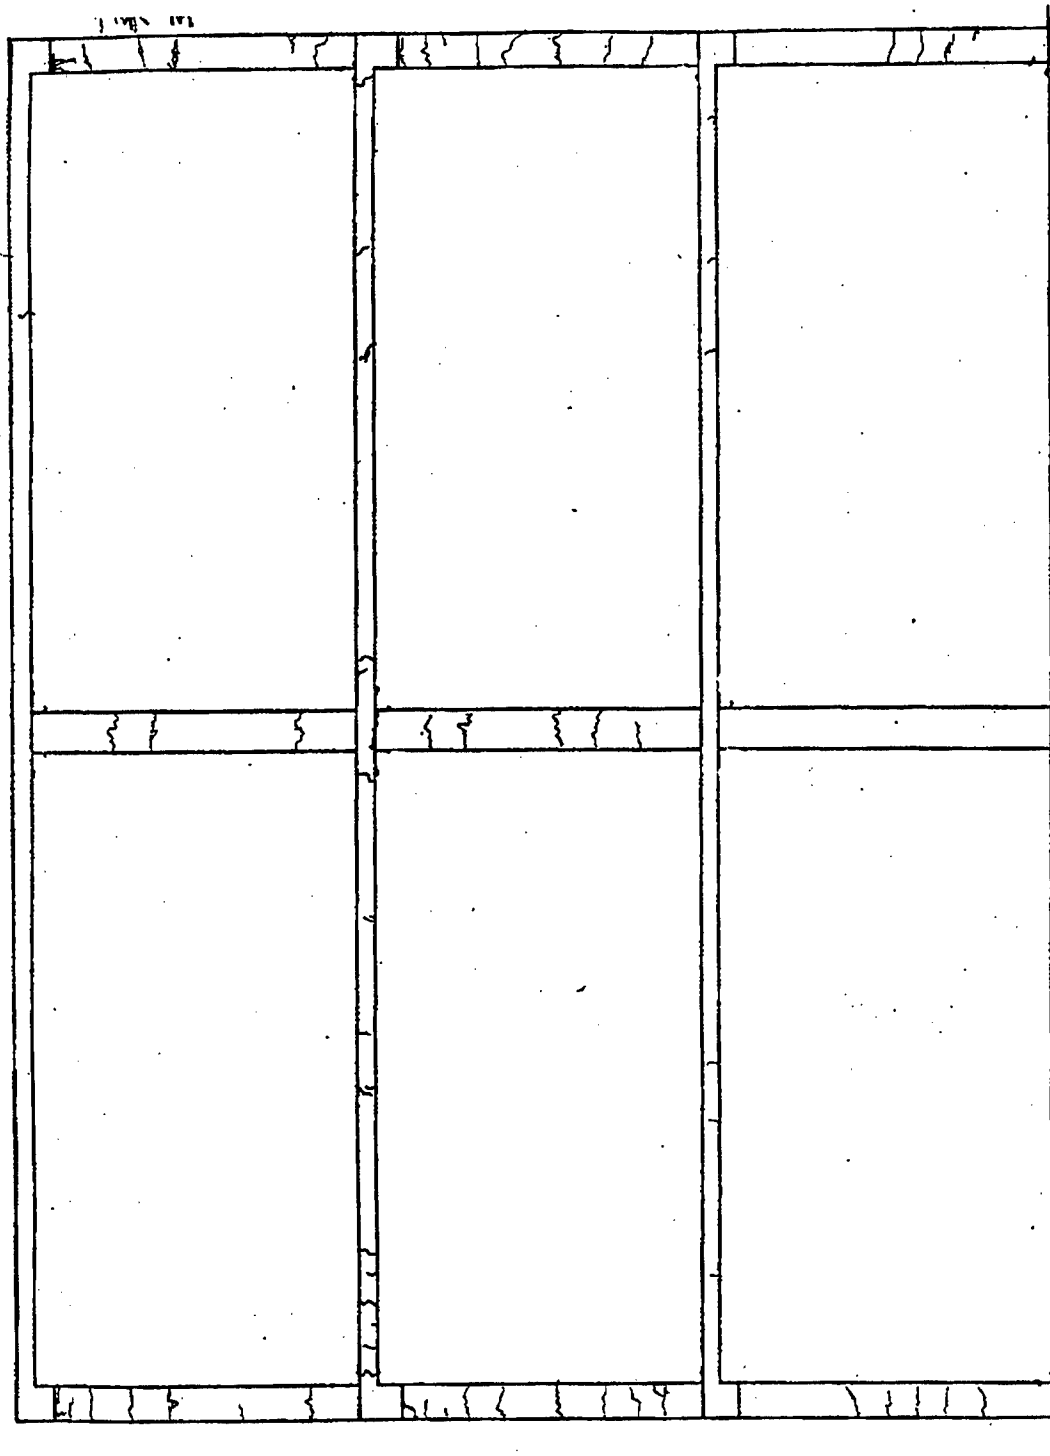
Crack Pattern, East Side of East Columns, Post-E200N
